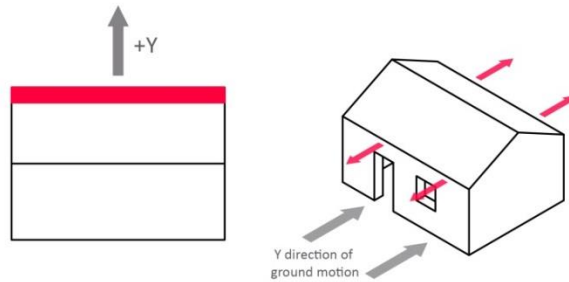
In the case above, when evaluating loading direction +Y, which is parallel to the slope direction of the roof, the wall perpendicular to the loading direction is subjected to both the seismic action and the possible roof thrust (plan and 3D view)
